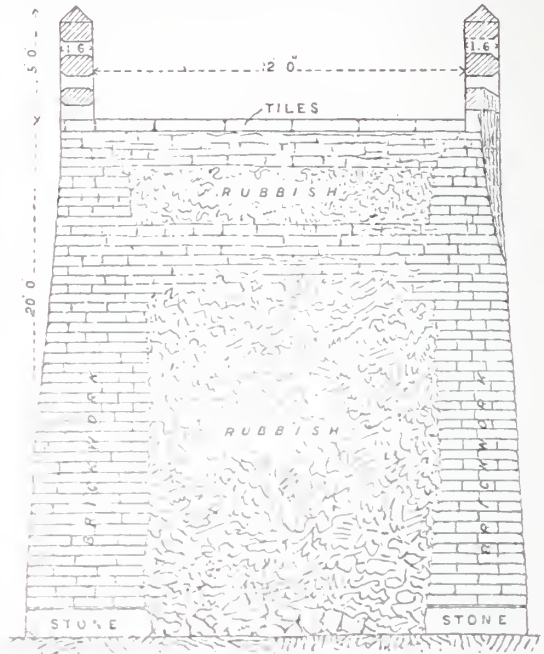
SECTION OF GREAT WALL AT KUPEI KOW.
